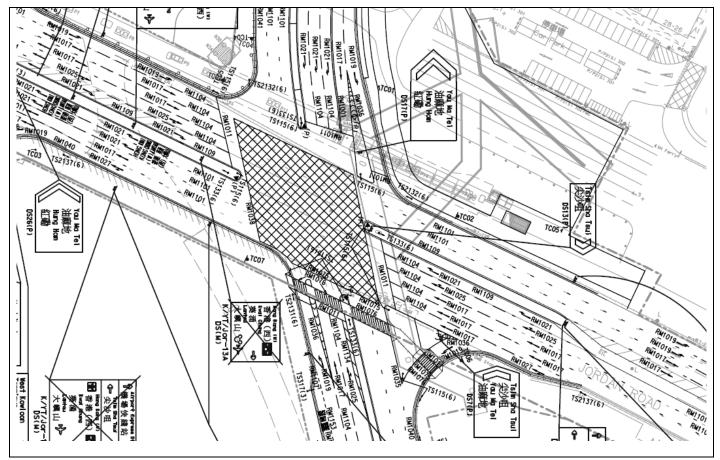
Planned Junction Layout of Canton Road/Kowloon Park Drive (J20)
